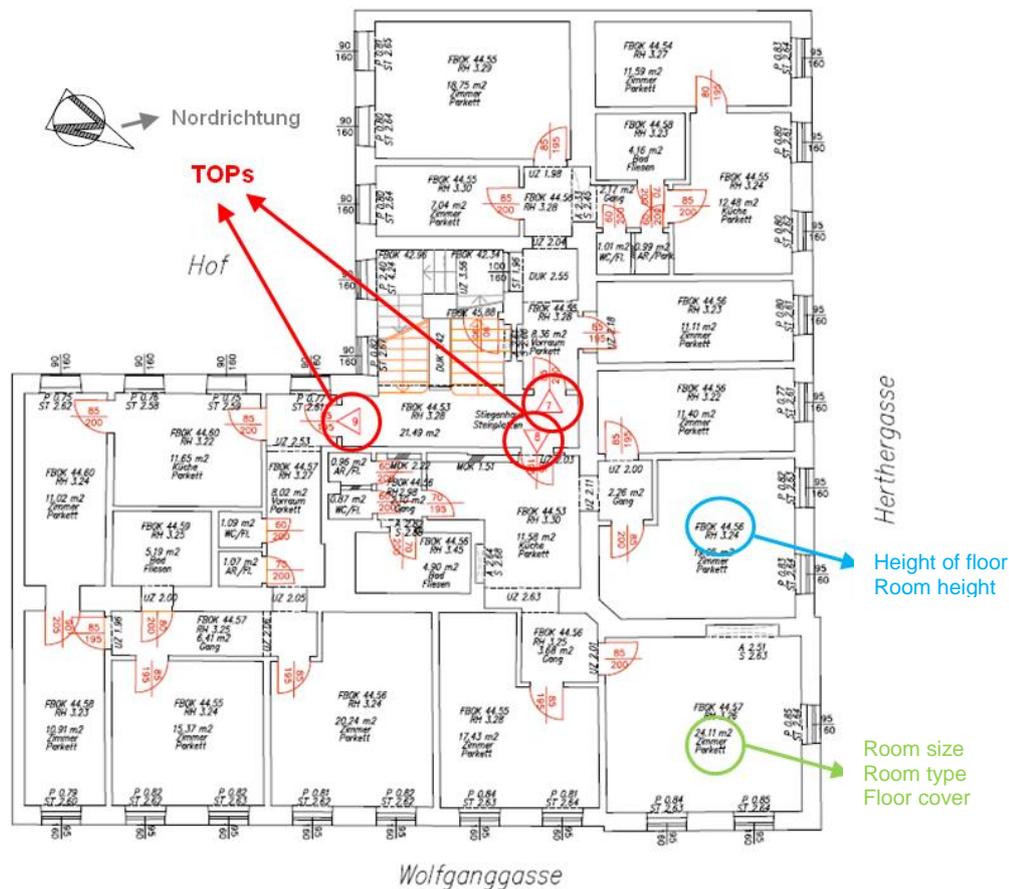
Example of a floor plan (adapted from Schwai, 2017, p. 68, data: Vermessung Fuchs)
